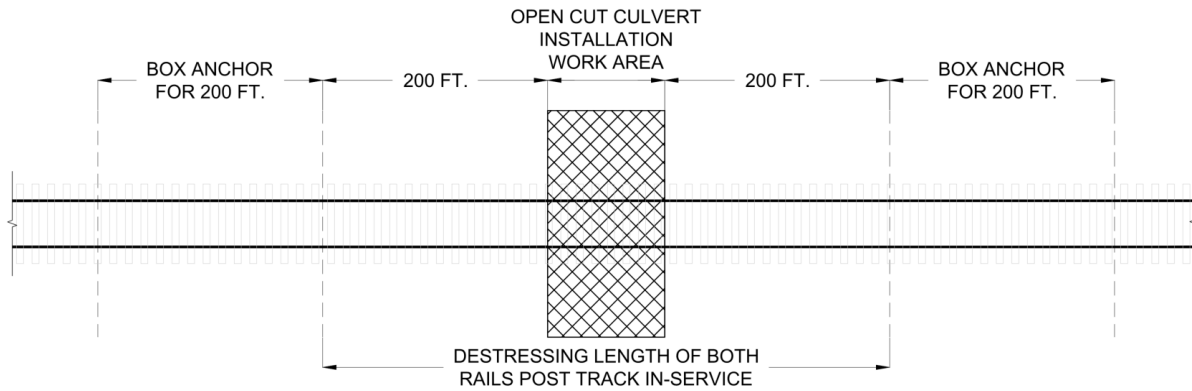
A. Destressing Length for Open Cut Culvert Installations
